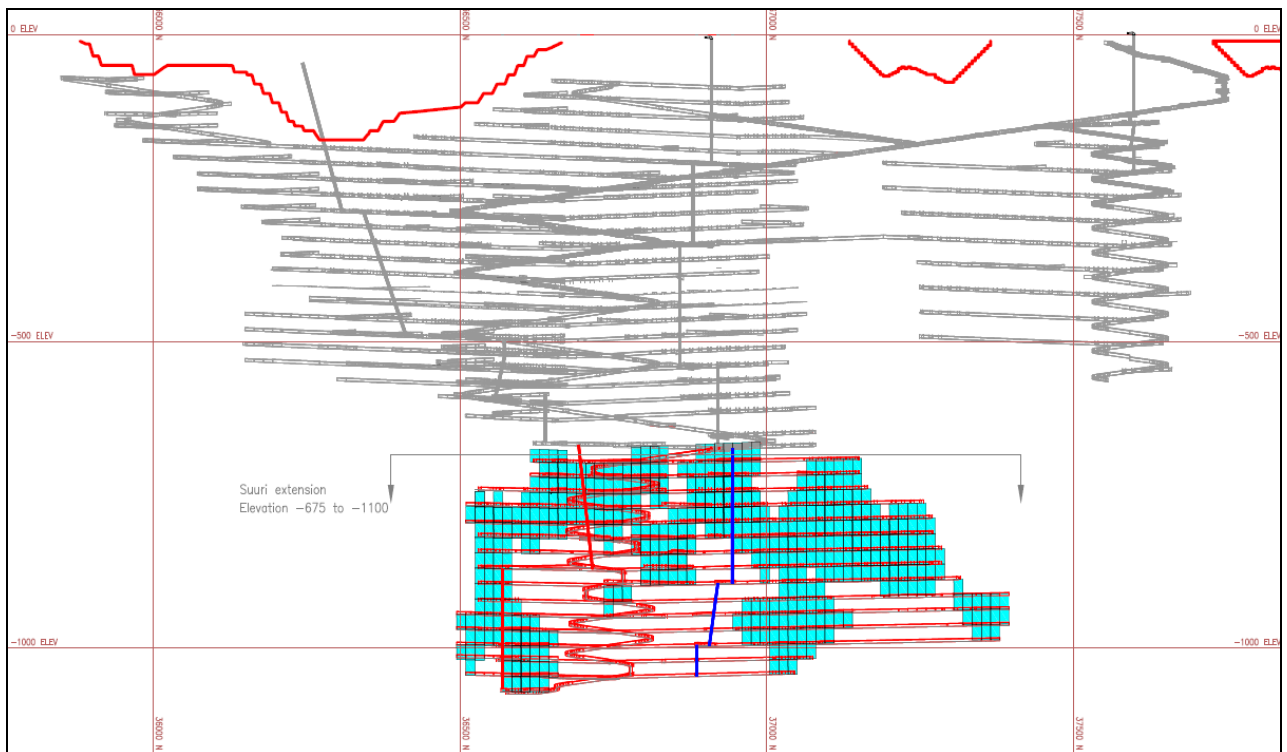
Simplified layout of the underground mine at Kittila, including the Suuri Extension
